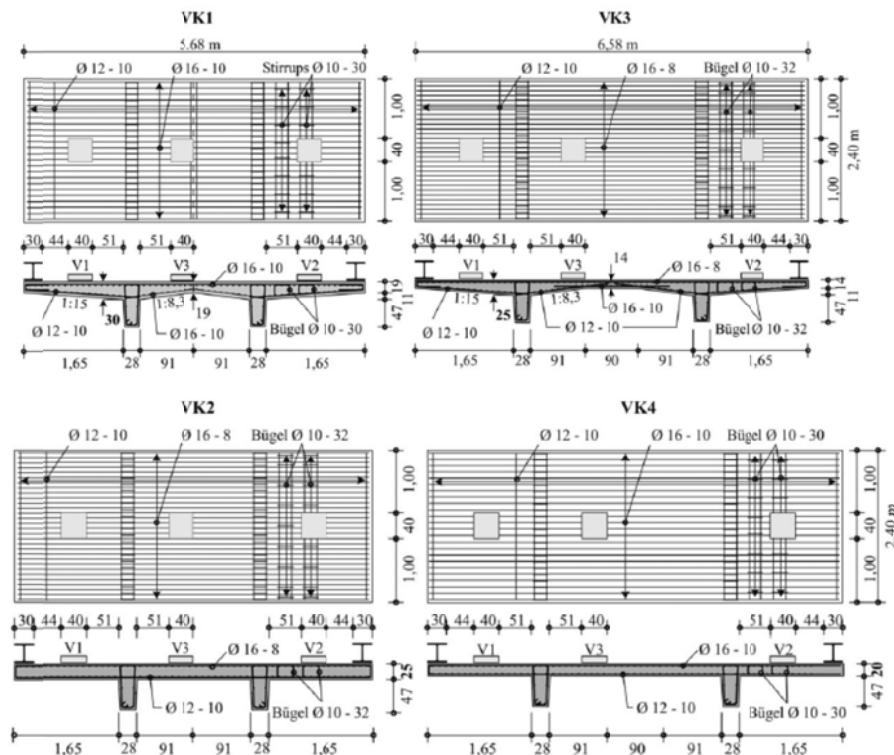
Dimensions and reinforcement layout of the test specimens VK1 to VK4, (Rombach and Latte, 2009).
